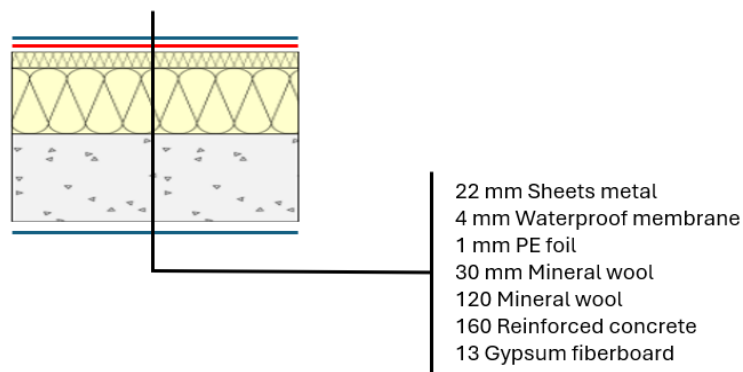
Details of existing roof (Laven and Strandberg, 2019, Cecilia Björk, 2021)
